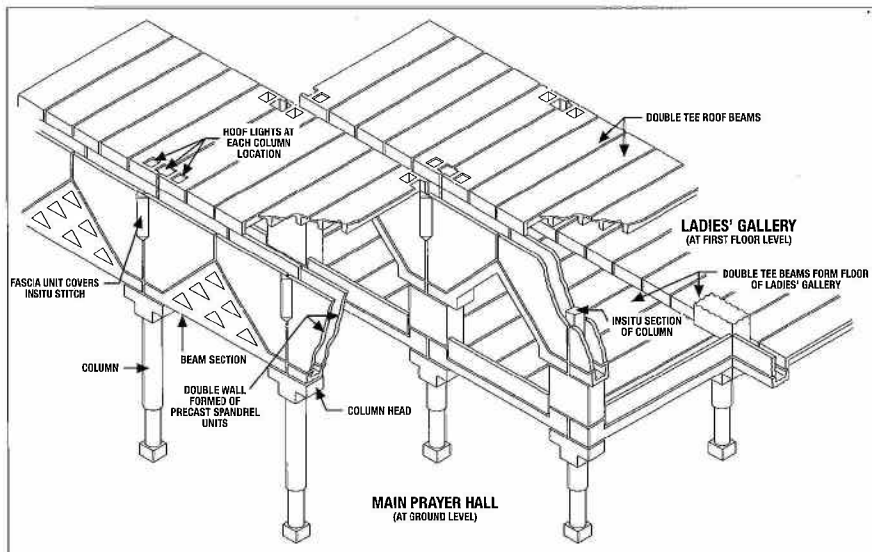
Isometric through mosque showing arch, beam, column and roof structures
